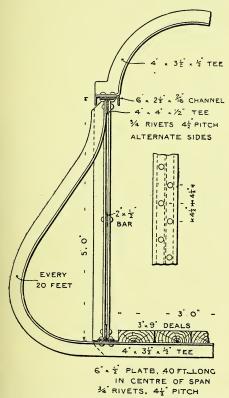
Part Cross Section of Lattice Girder Footbridge.
